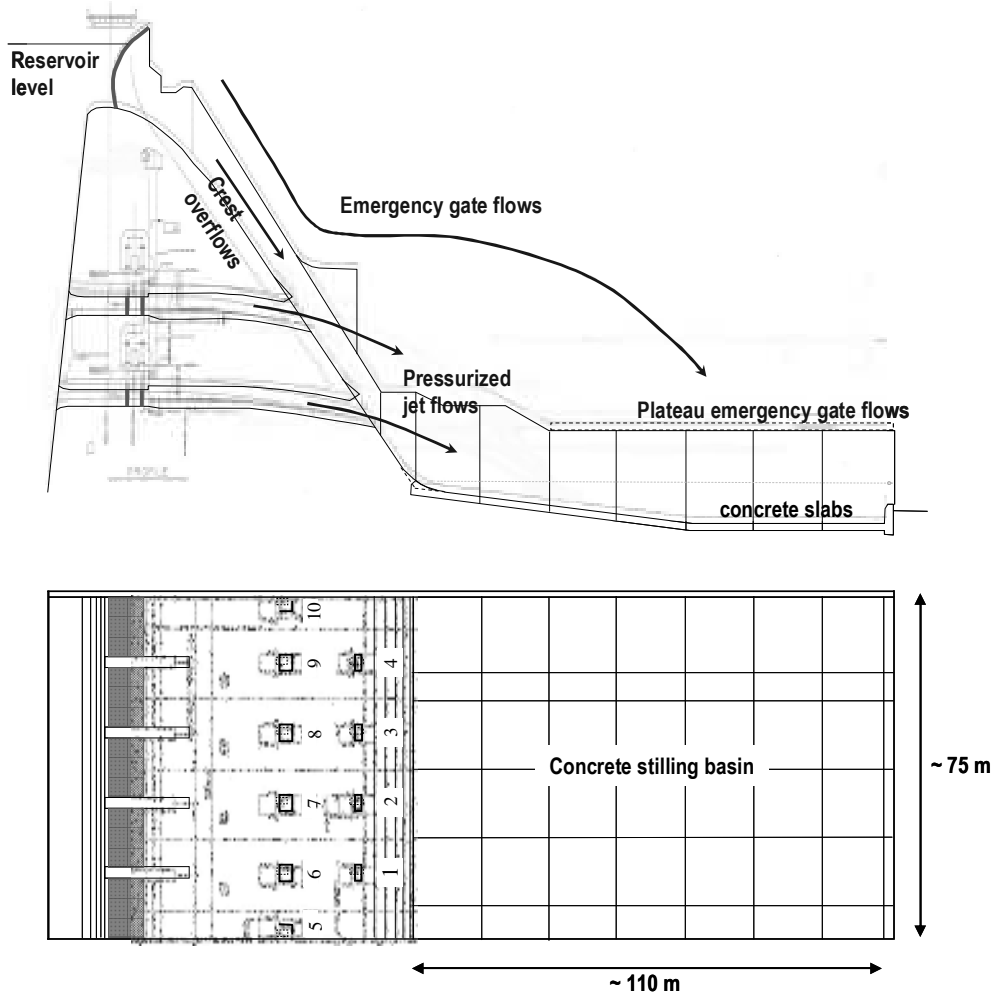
Plan view and cross-sectional view of high-head dam and stilling basin
